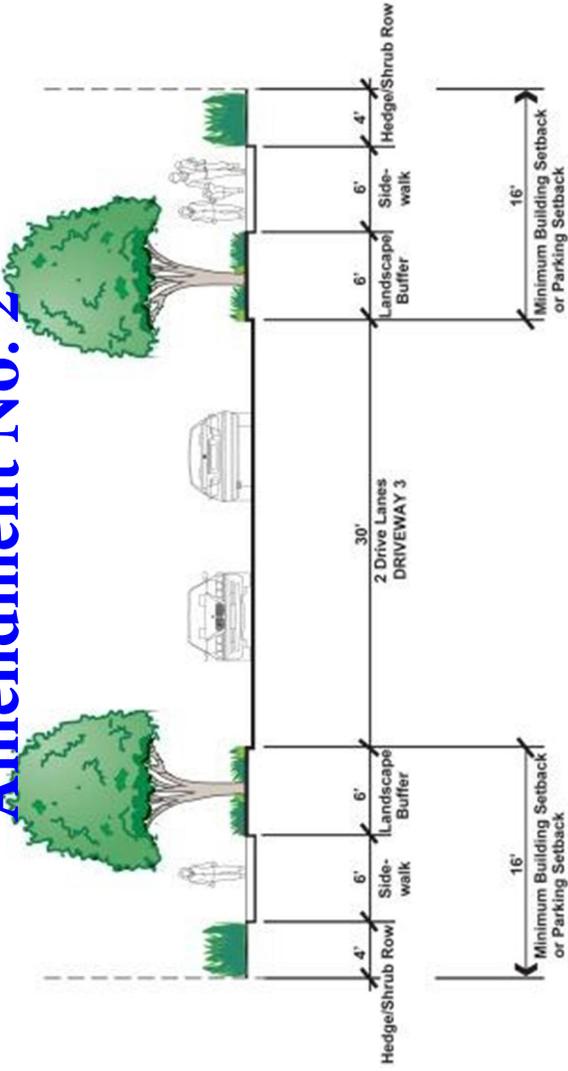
DRIVEWAY 3 CROSS SECTION
